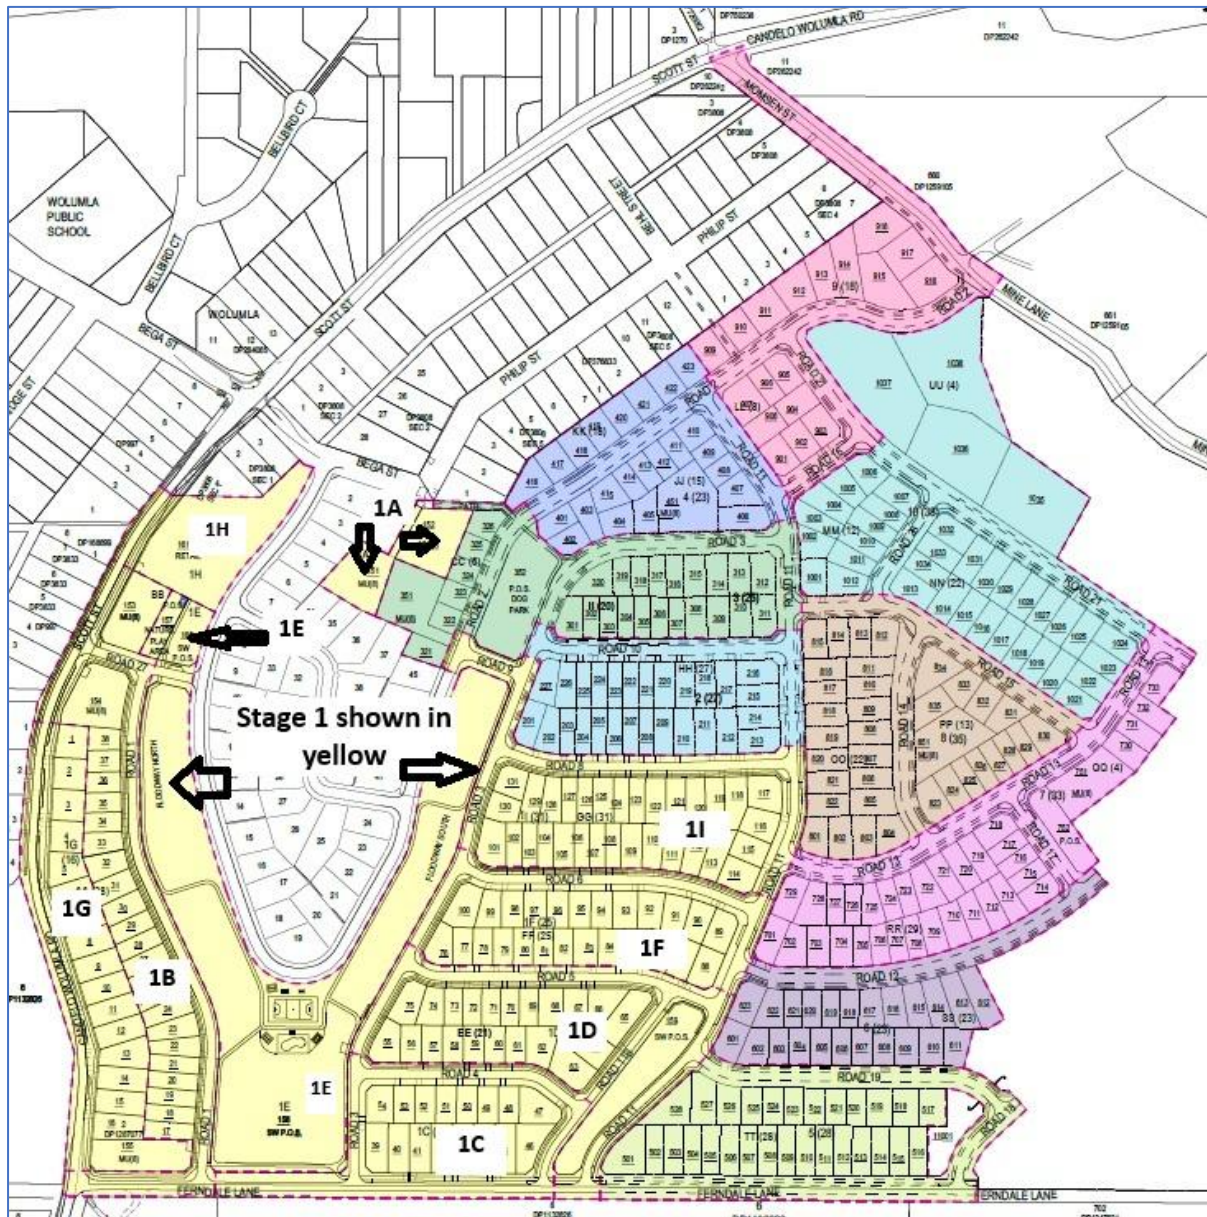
Wolumla Valley Subdivision Plan Stages 1 to 10
